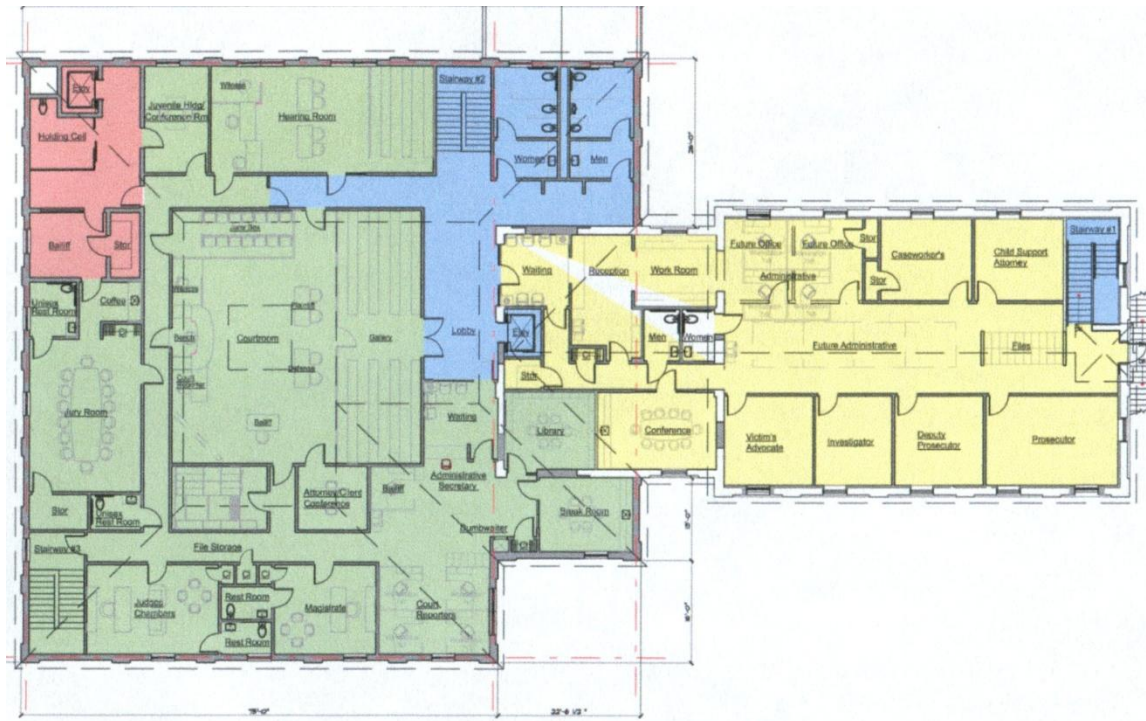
First floor plan for proposed Courthouse expansion. Prosecutor's Office is shown at right, with Circuit Court offices to the left. Source: ADS 2012 study.
